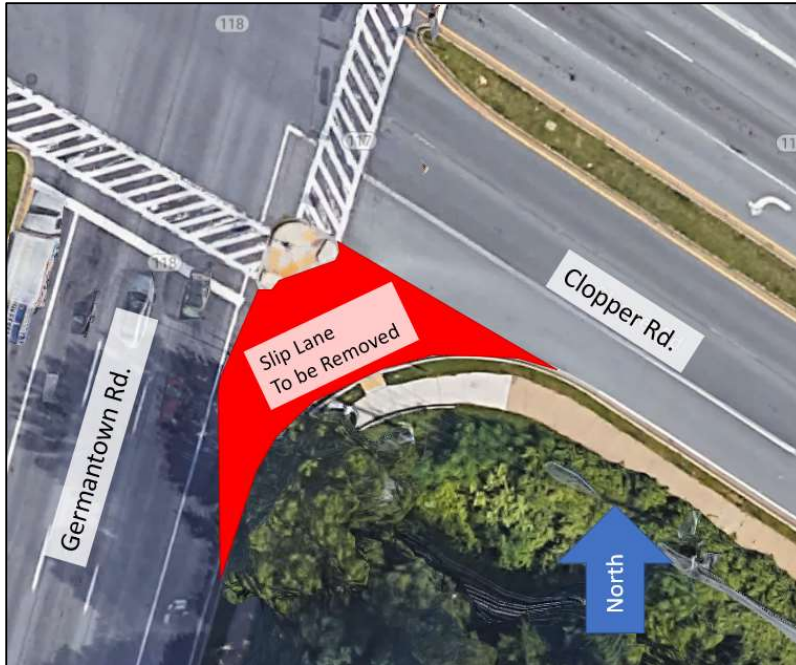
Slip Lane to Be Removed at Germantown Road / Clopper Road Intersection
